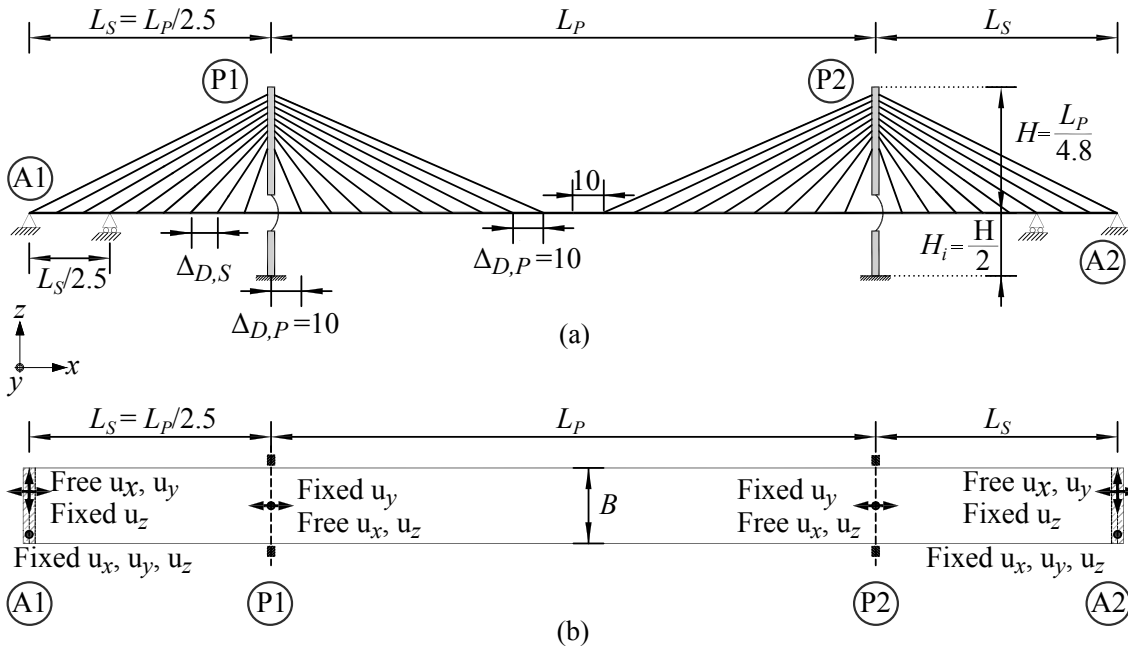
Parametric definition of the cable-stayed bridge models. (a) Elevation, (b) plan view. All dimensions are in [m].
